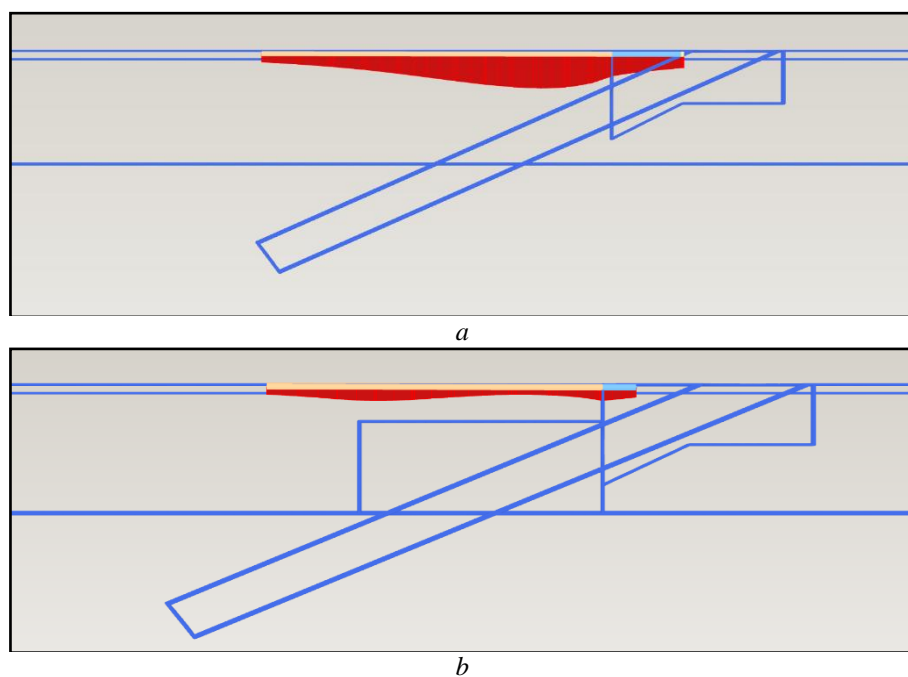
Trough movement during construction of Spasskaya underground station escalator tunnel:
